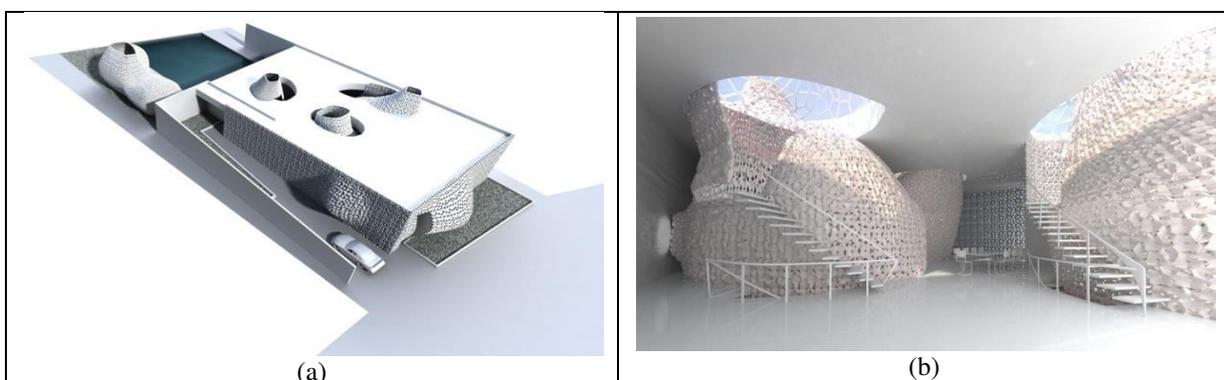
The project “3D Printed House 1.0”: (a) building view; (b) internal volume (interior).
